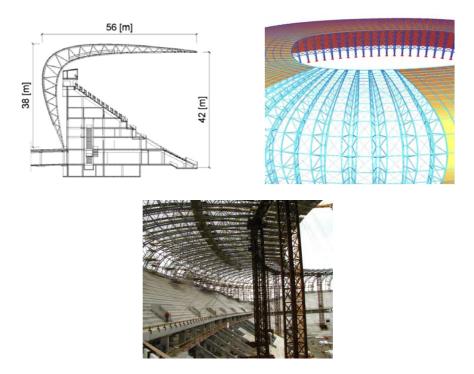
Roof structure. Static model (SOFiSTiK) and photo made 18.08.2010
